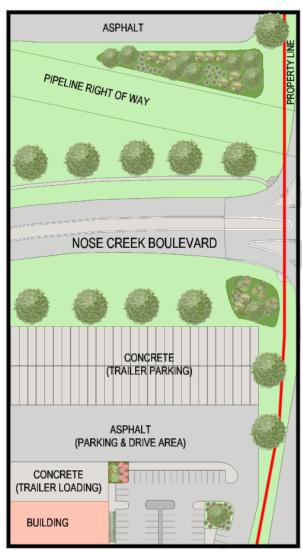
PEDESTRIAN CONNECTIONS, OPEN SPACE AND LANDSCAPING
